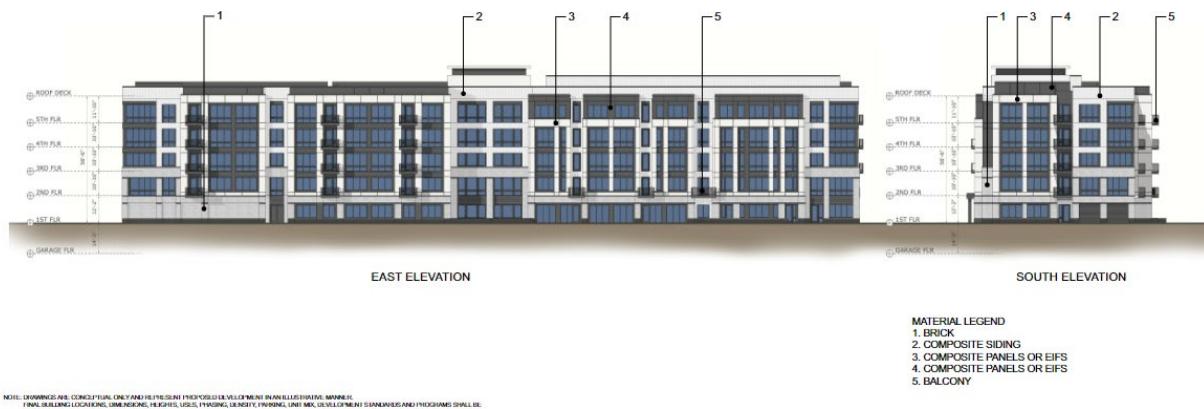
East Elevation (facing Sumner Condominium), and South Elevation (internal to the Site)
